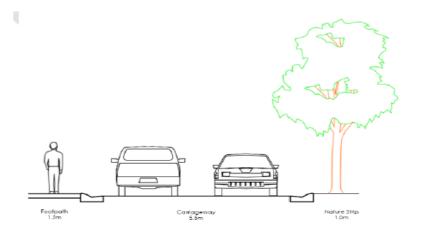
8m Road Typical Cross-section (Secondary Internal Road)
